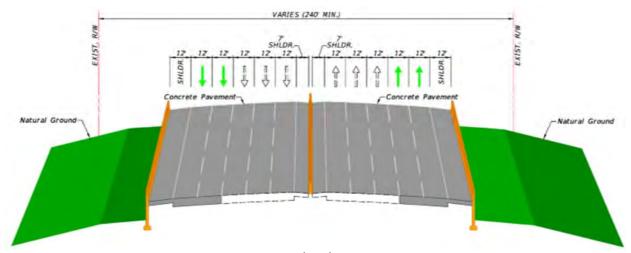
Proposed I-10 (SR 8) Widening Typical Section
